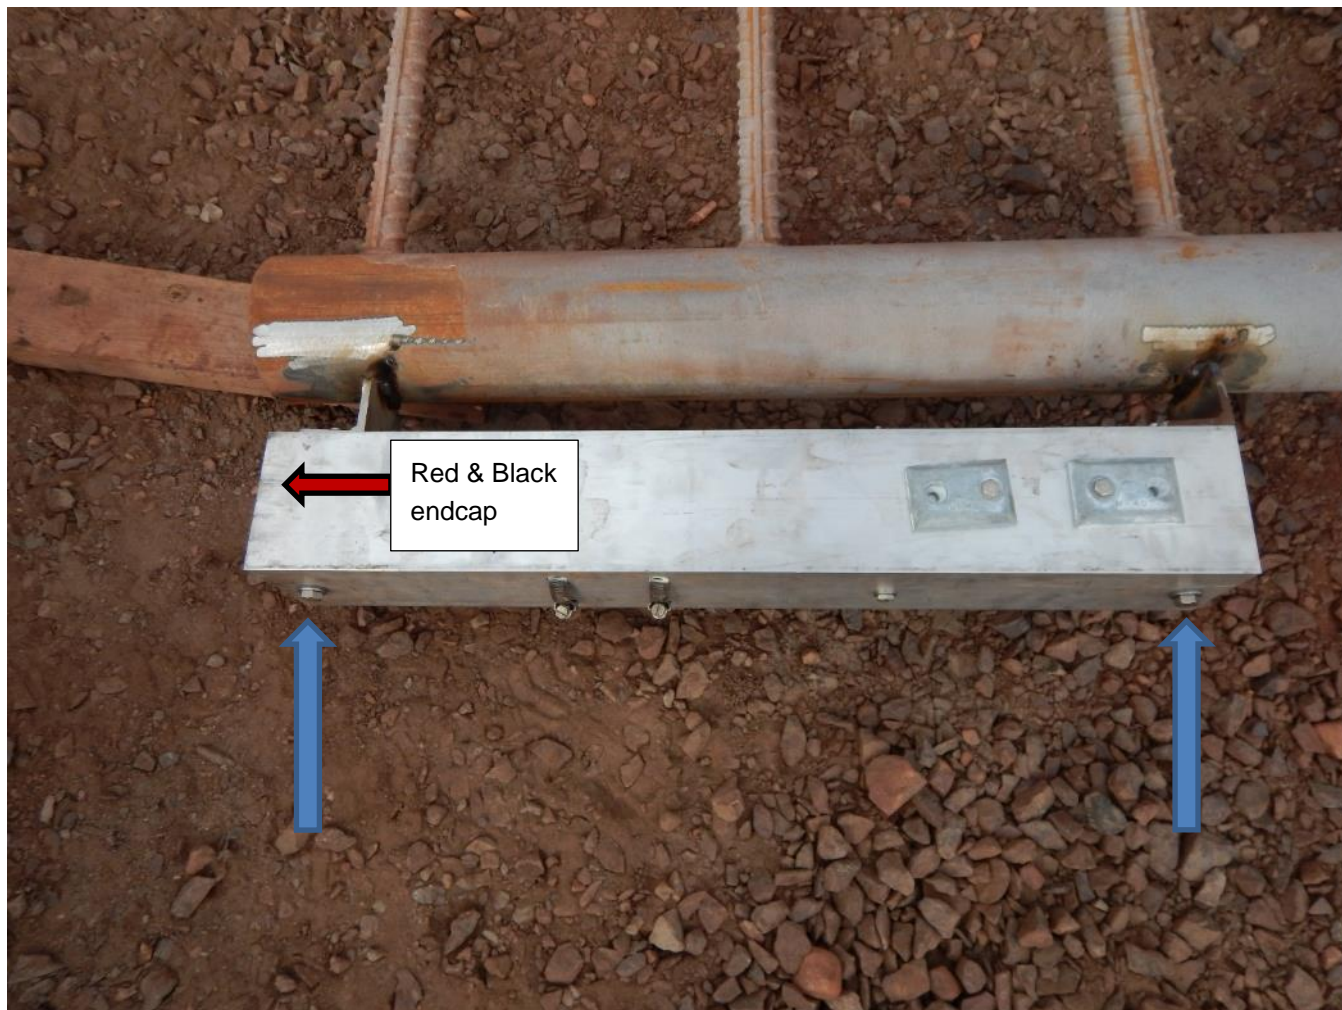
Aluminum square tube mounted to the bottom of the steel ladder located at the ore dock. Arrows show location of mounting bolts which attach the square tube to the welding tabs on the steel ladder.
